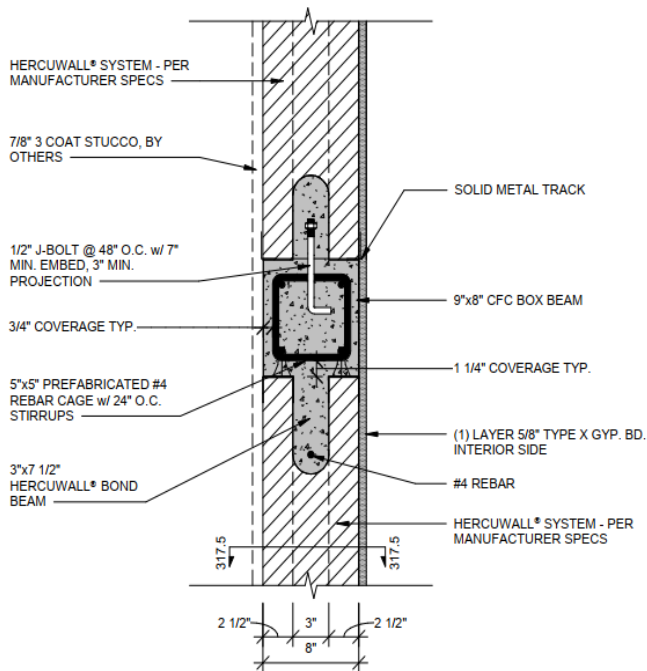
1-hr Load-Bearing Unbraced CFC Box Beam Wall
